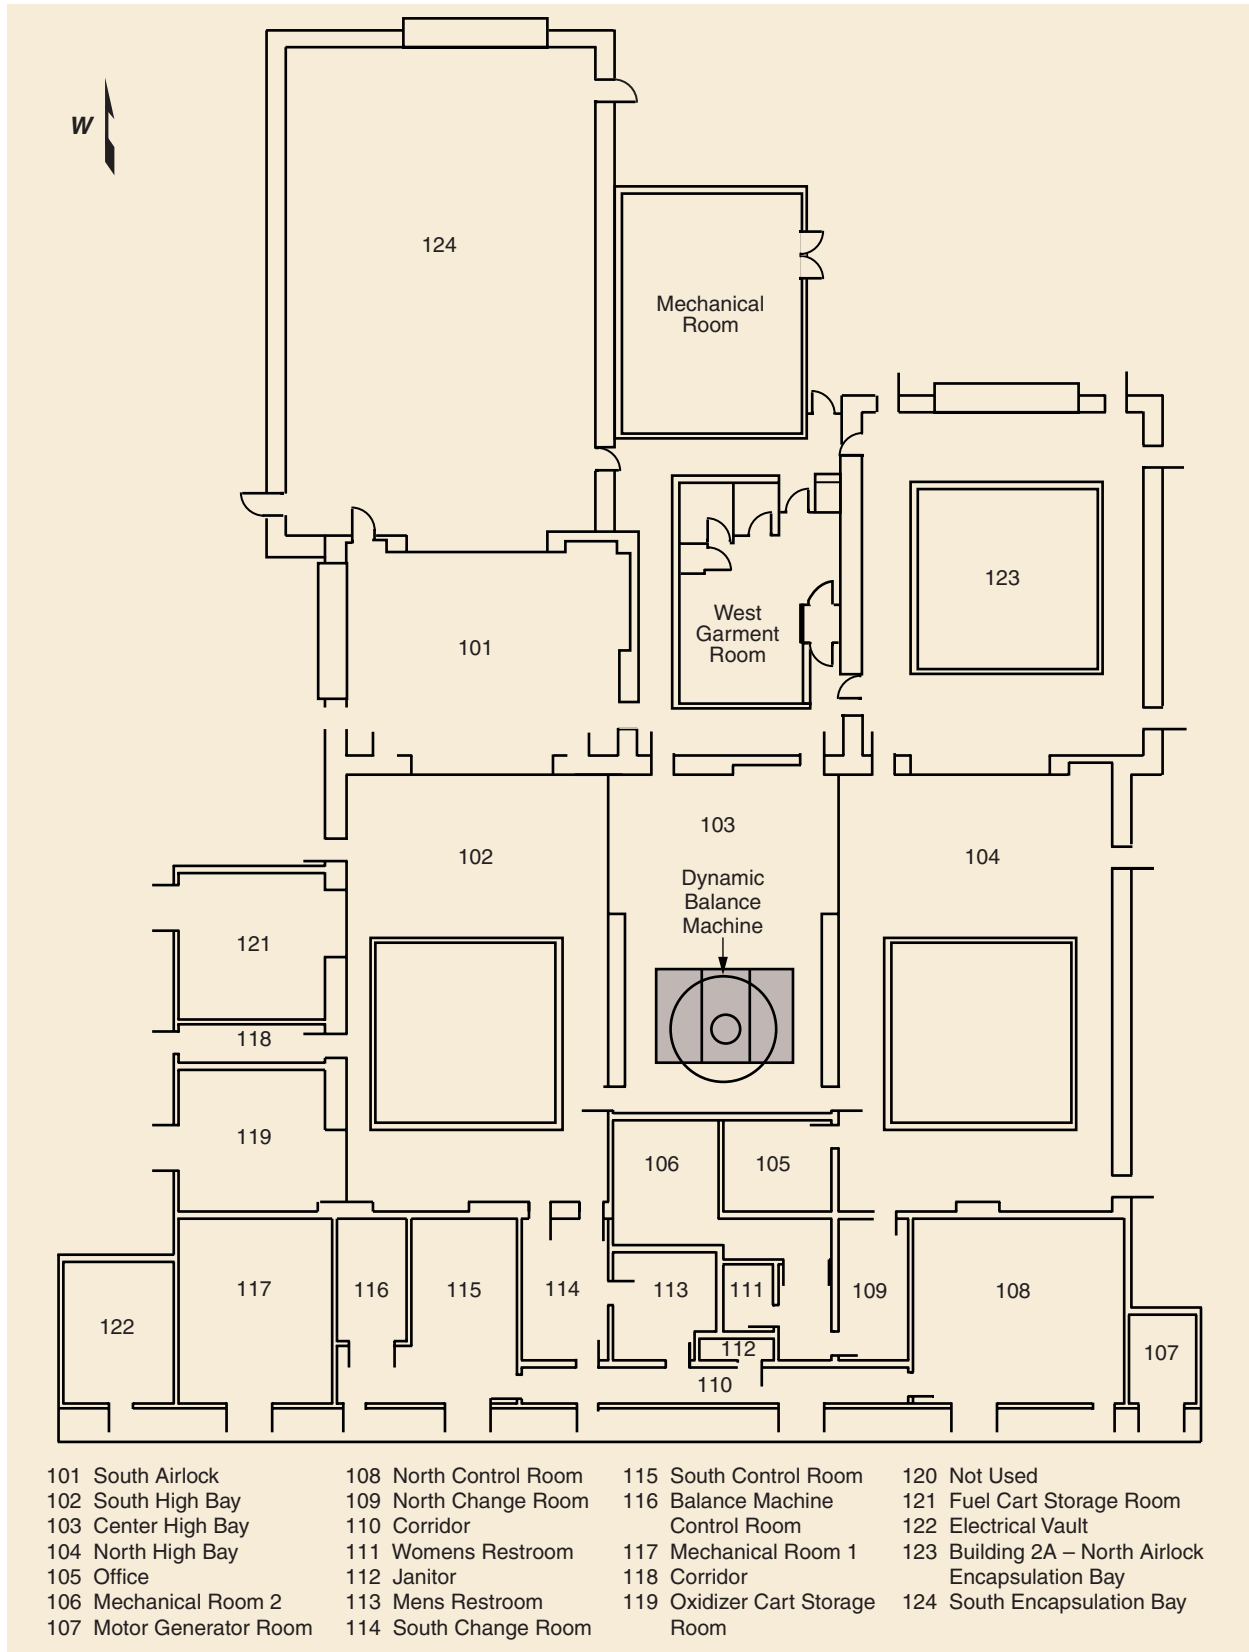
Building 2 (HPF) Detailed Floor Plan, Astrotech
